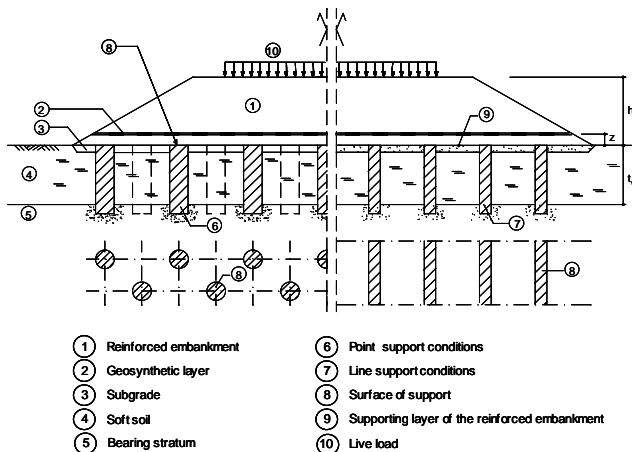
Geosynthetic-reinforced pile-supported embankment
